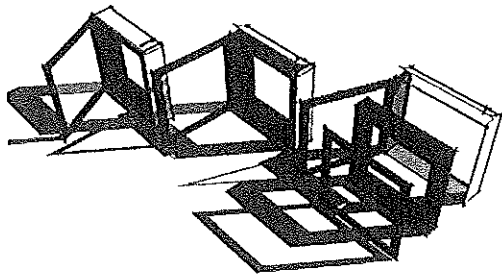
Final Window Configuration Showing Internal Opening Glazing
